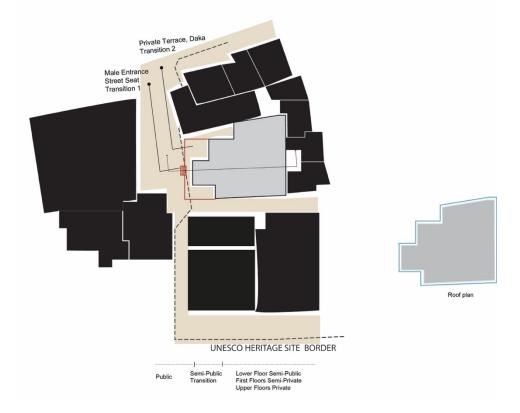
Indicating the visible thresholds in plan and their relationship to the street and surrounding buildings. Source: Author.
